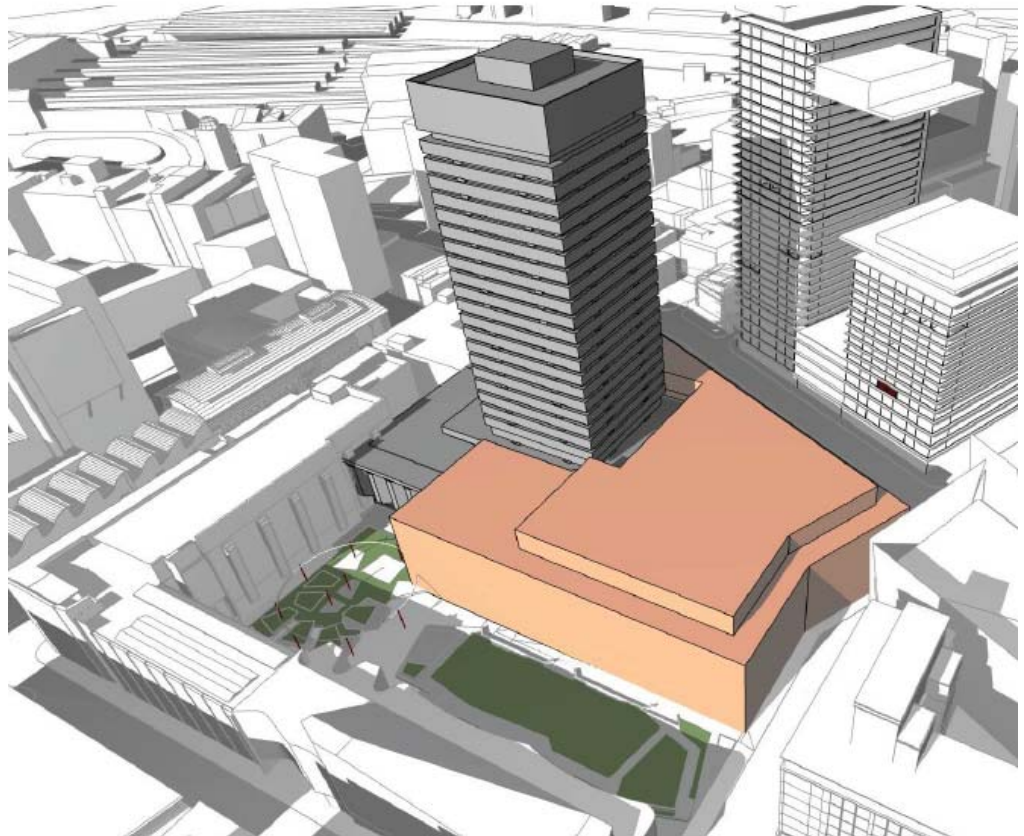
View of existing approved Building 2 podium envelope (in beige)
